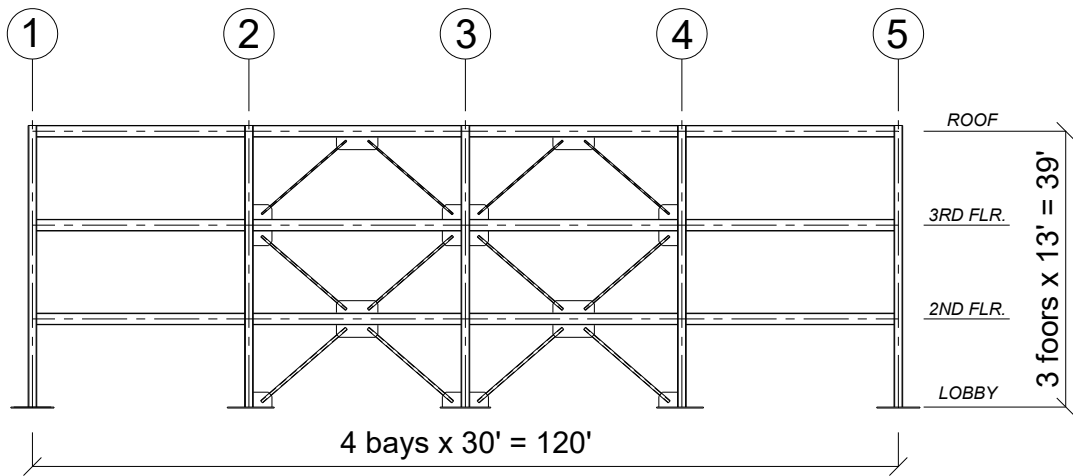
Elevation and brace configuration of the three-story archetype building.
